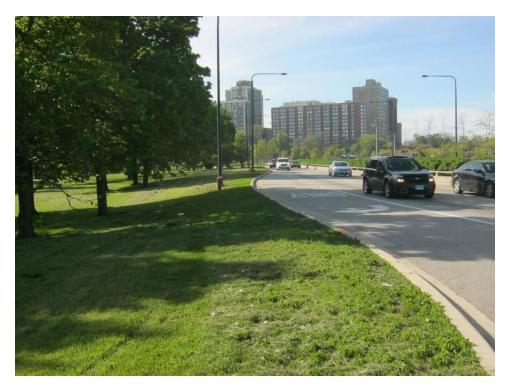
View from west of Lake Shore Drive, north of Science Drive, looking north
